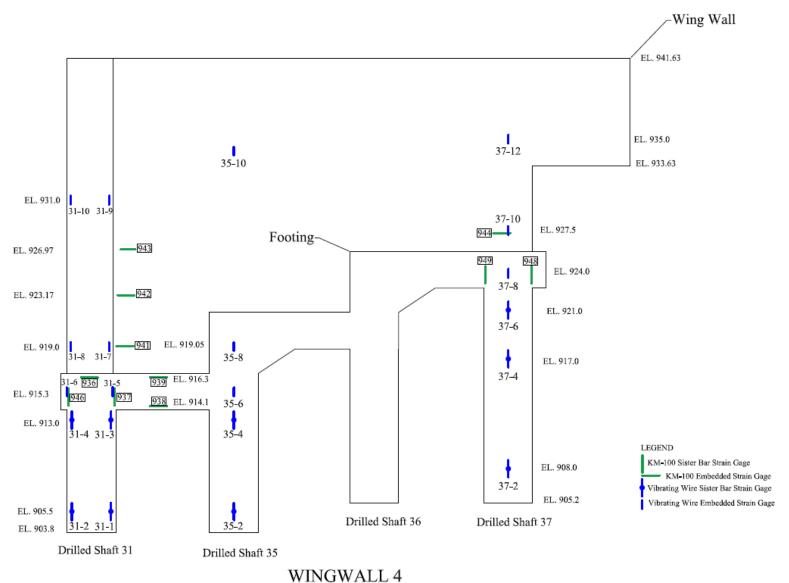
Gage locations in footing and Wingwall 4 (EL in ft: 1 ft = 0.305 m).
